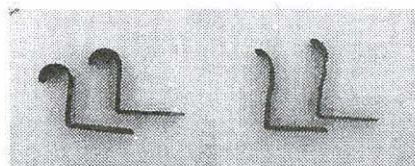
Drop Hook Failure Mode (left) Drop hook prior to testing and (right) drop hook after failure.
